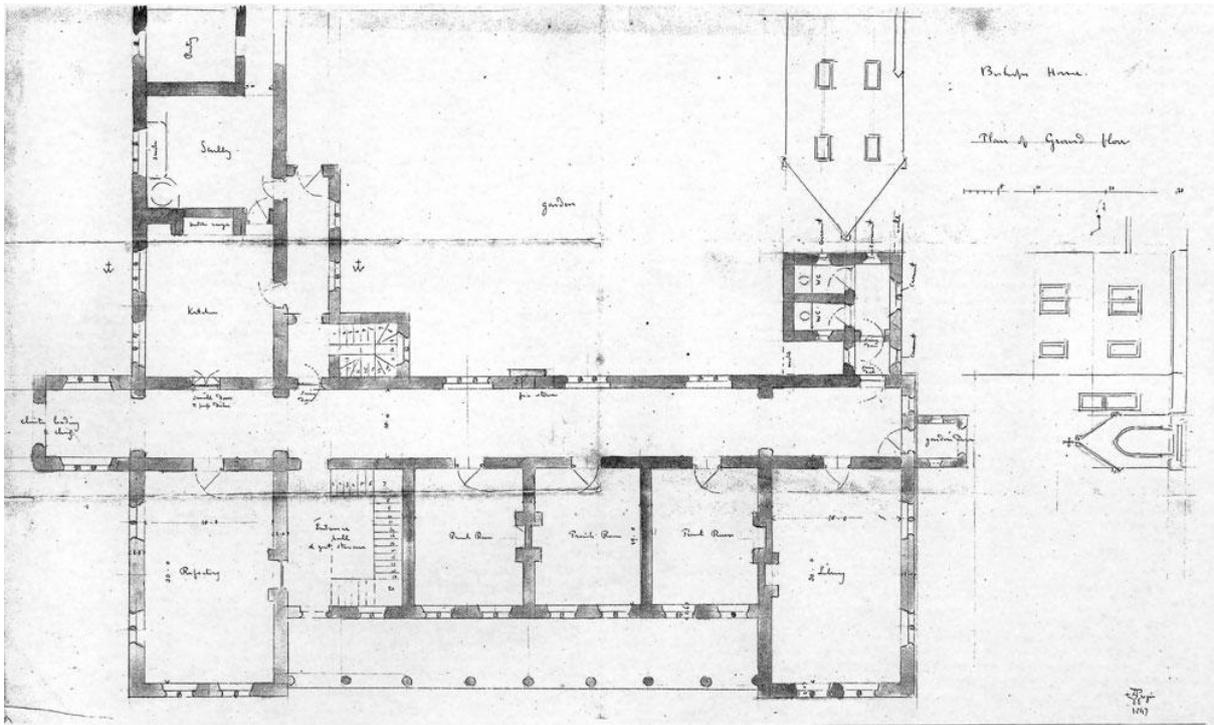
Ground floor plan (Courtesy: Peter Cheney)
